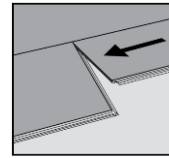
Cut to length– remember sawing tips, if cutting using a drop-saw or hand saw, cut it with the visible face up. Then install it as per previous plank. If using a jig saw its face down to avoid chipping.
